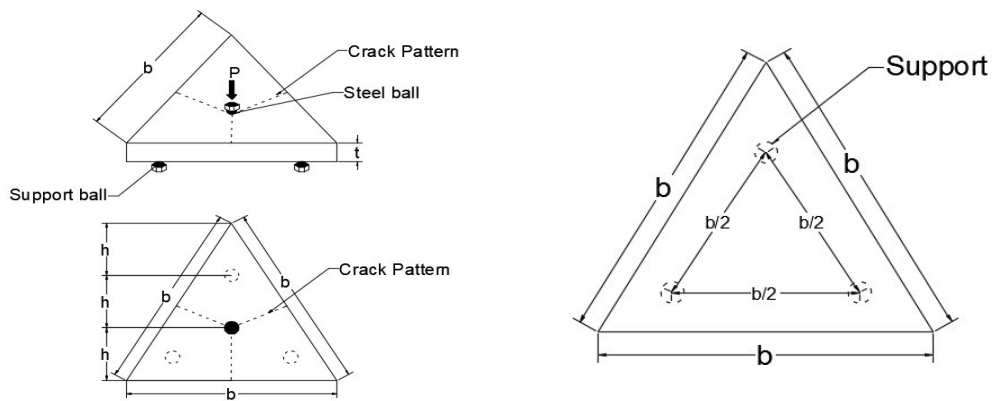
Geometry of the triangular plate specimen and support layout.
